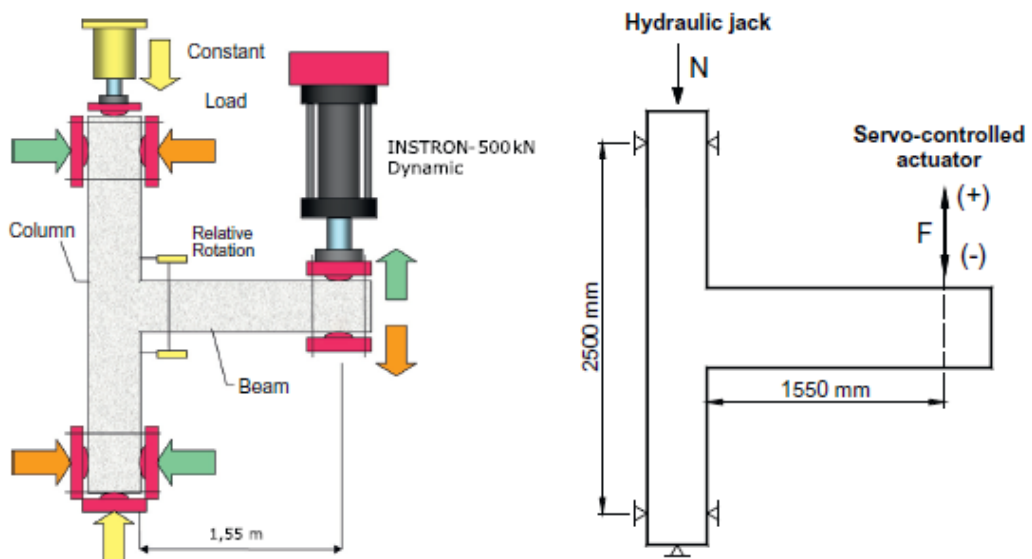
Applied load and static equilibrium for exterior beam-column connection (Alva et al. 2013)
